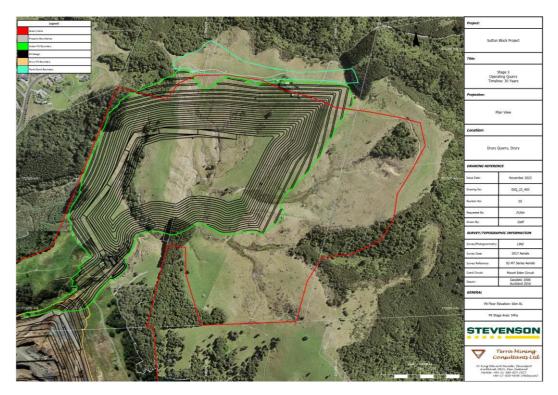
Sutton Block - Pit Plan - Indicative 30 - year.
